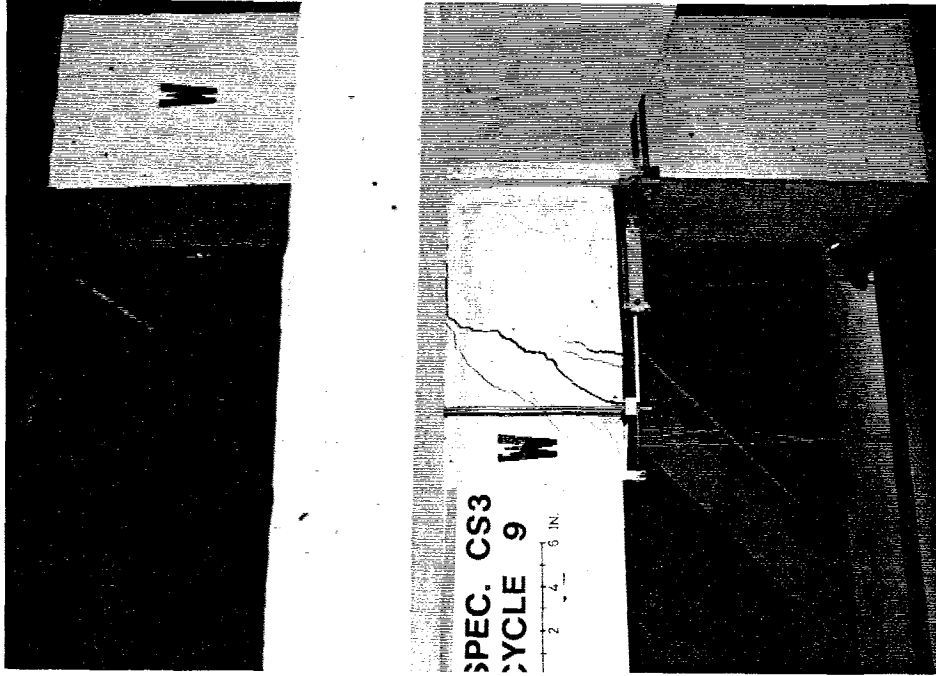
(b) Flexural Cracks in Specimen CS3 (Right Connection)
